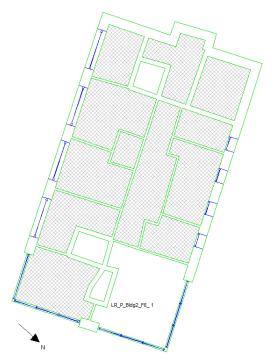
Level 6 living rooms in Building 2 (larger plan in Appendix A)
